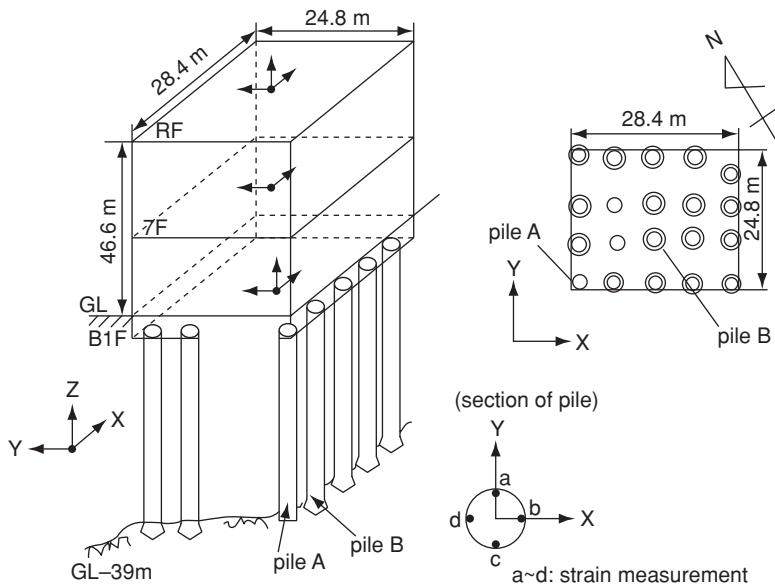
12-story steel building with 20 piles at Yokohama in Japan
